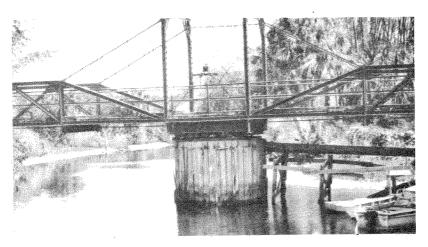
Illustration No. 37. East view of the "Turn table bridge" constructed in 1911/1912, showing the metal frame construction. This bridge was constructed after a flood, which destroyed the circa 1902 bridge, and was constructed to allow for passage of larger boats on the river. Photograph circa 1912.
